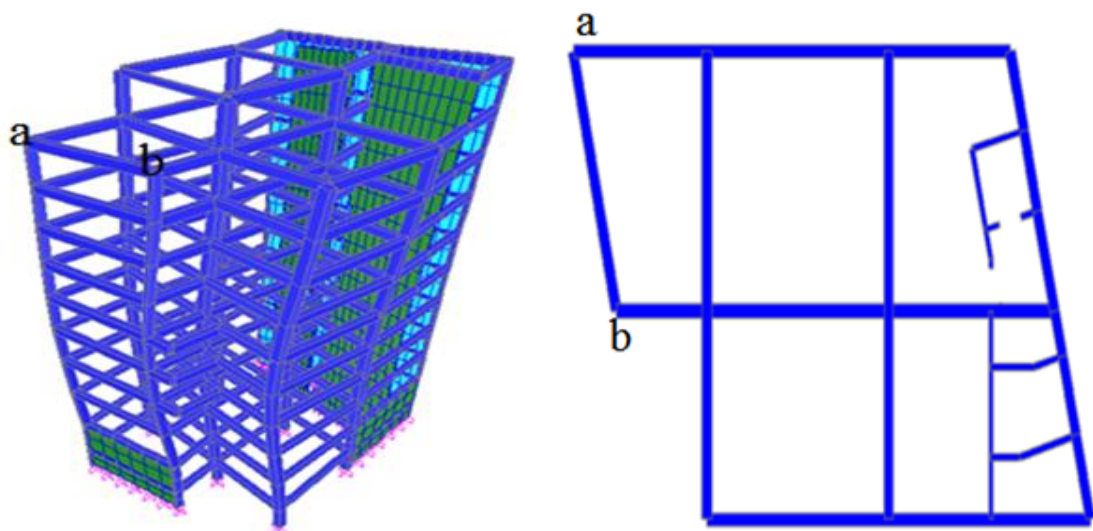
The deformed shape of building B (after analysis at 5th mode)
